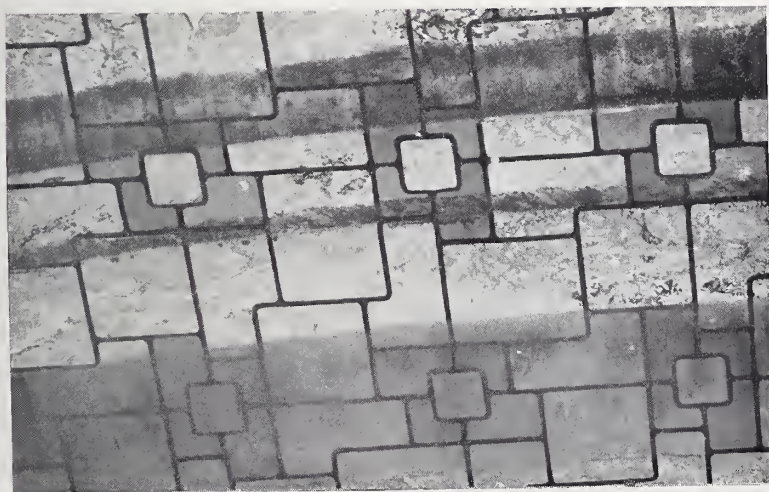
Standard-gage inlaid linoleum on wood subfloor (test panel 4-L).
